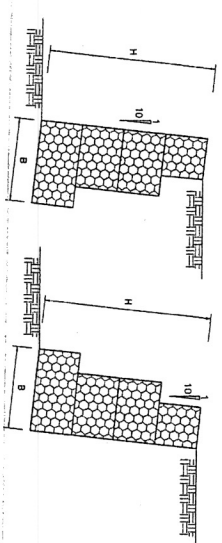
TYPICAL CROSS SECTION OF GABION WALL
